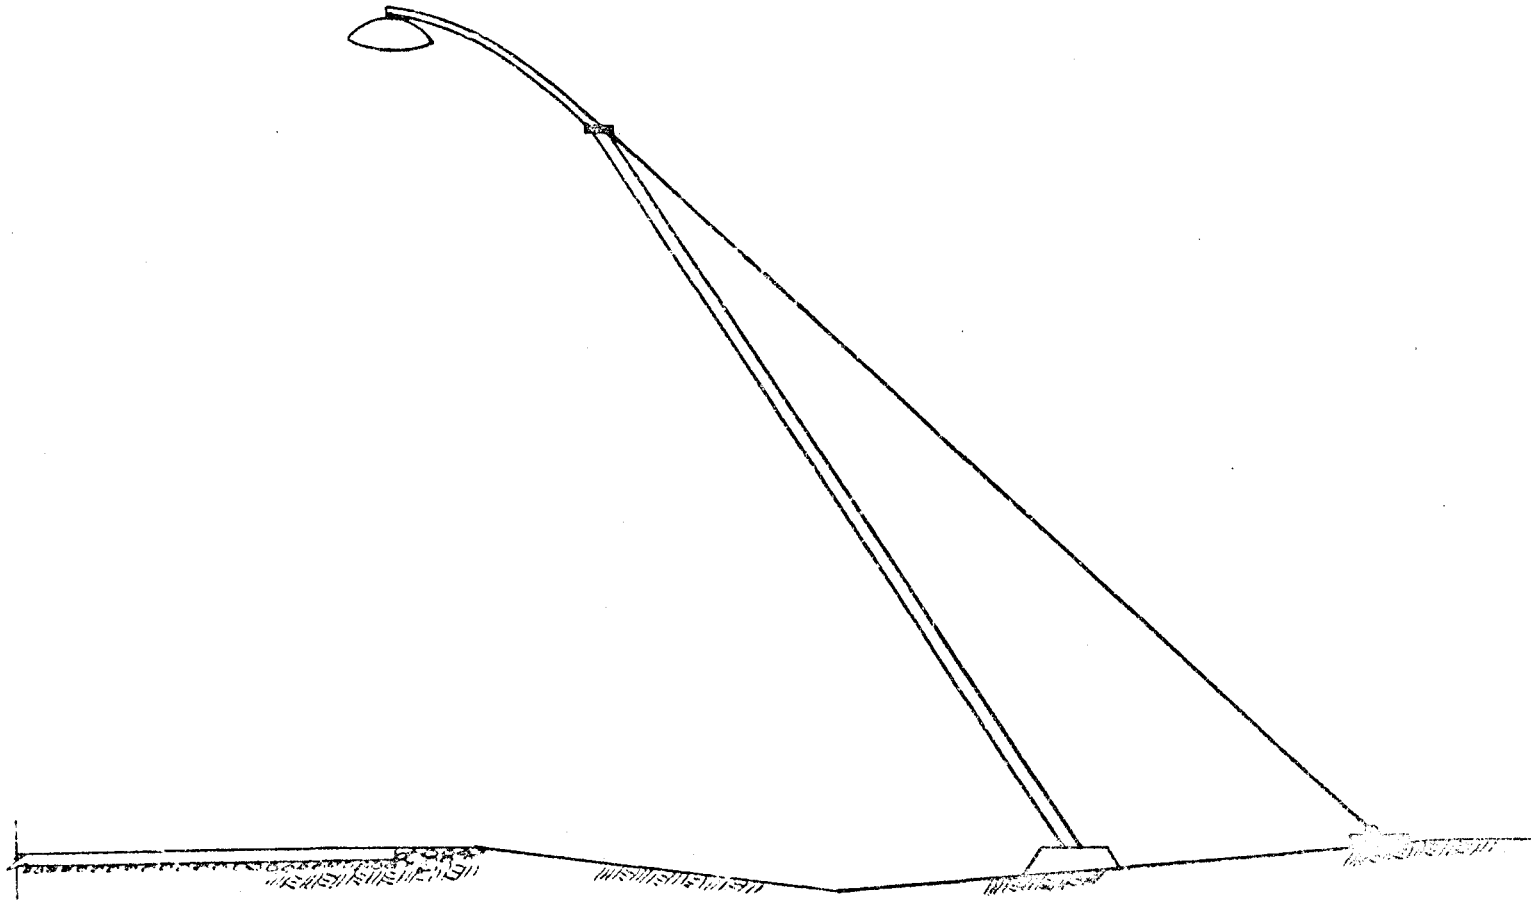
LIGHTING SYSTEM SUPPORT CONCEPT (PRELIMINARY DESIGN CONFIGURATION FOR 50-FOOT LUMINAIRE HEIGHT)
